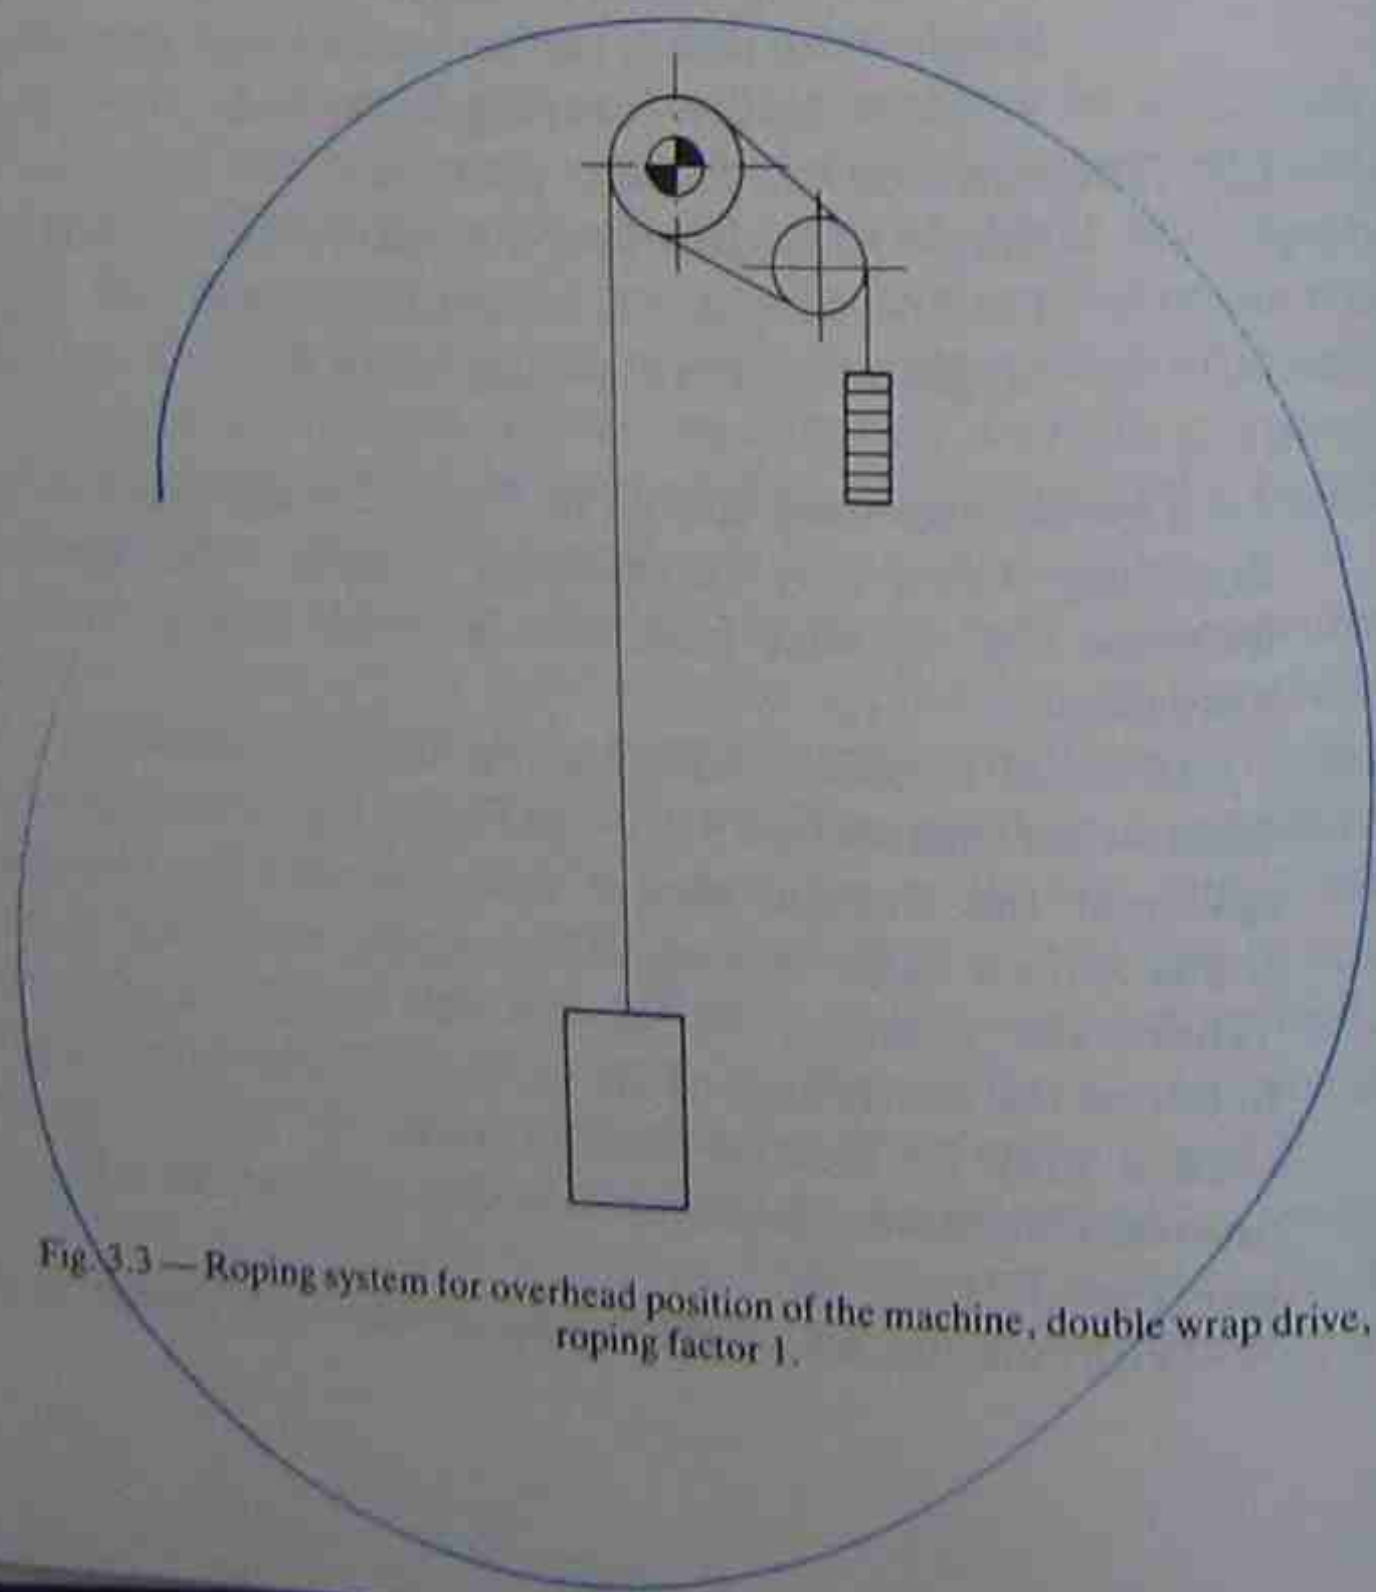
Roping system for overhead position of the machine, double wrap drive, roping factor 1.
